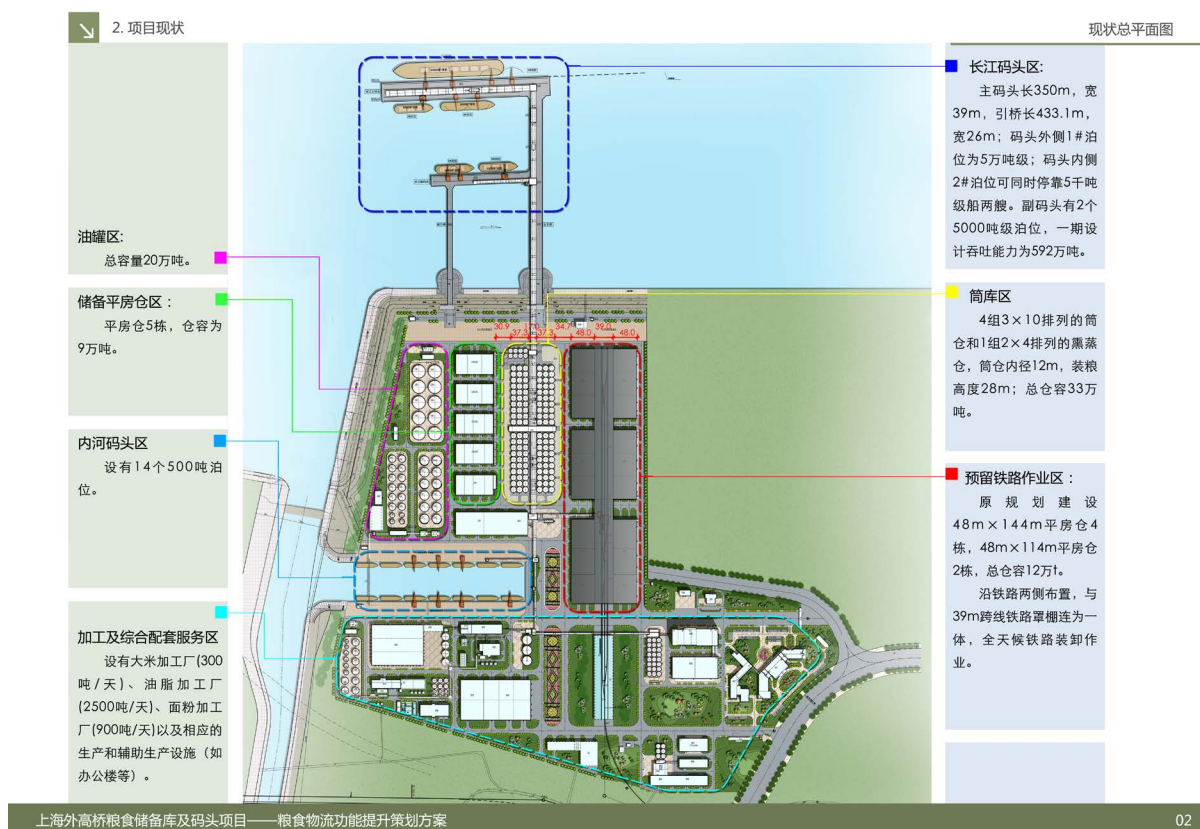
Site Plan of Shanghai Waigaoqiao foodstuff storage and dock
